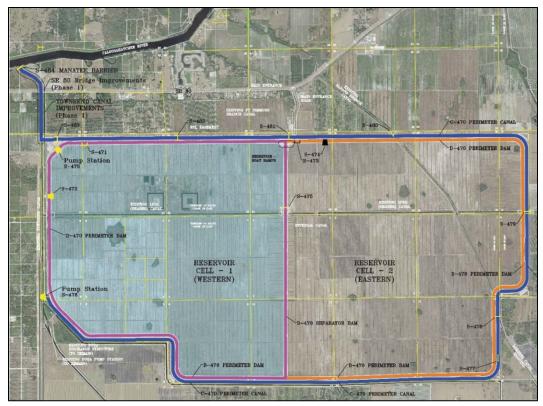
The Caloosahatchee River (C-43) West Basin Storage Reservoir site plan.
